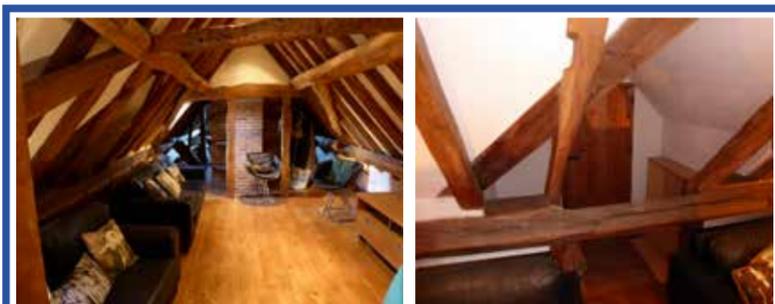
& 19: Existing habitable space within the roof form (second floor) is currently used as a storage space and provides access to redundant services.
